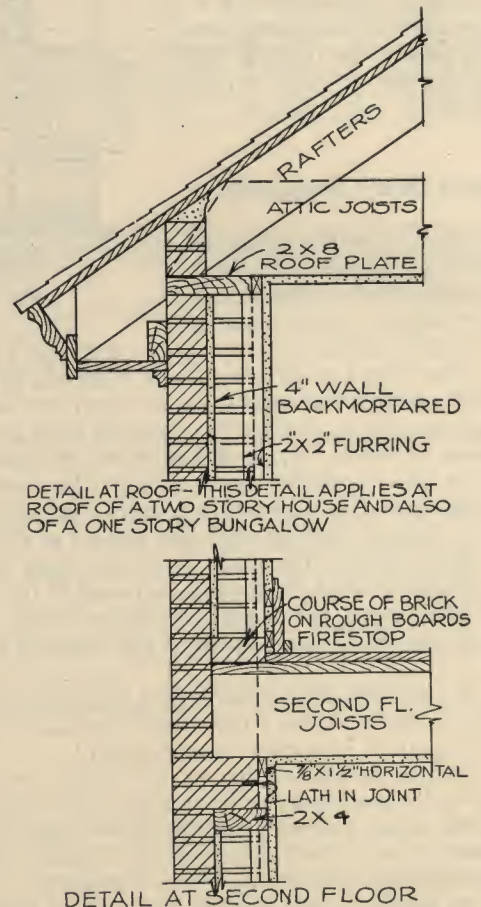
Section at second floor line and roof line, with joists at right angles to wall
